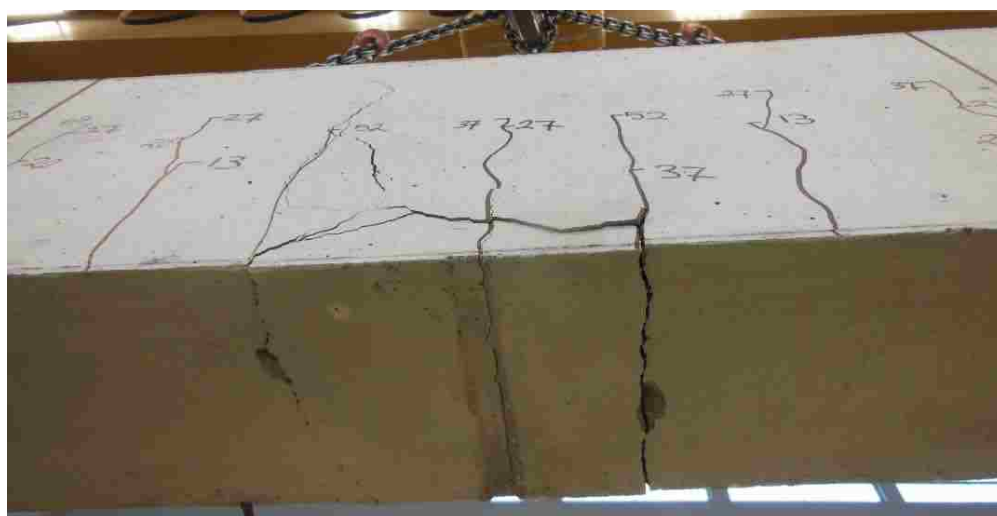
Crack Pattern of Specimen TWOC-60 (Bottom View)
